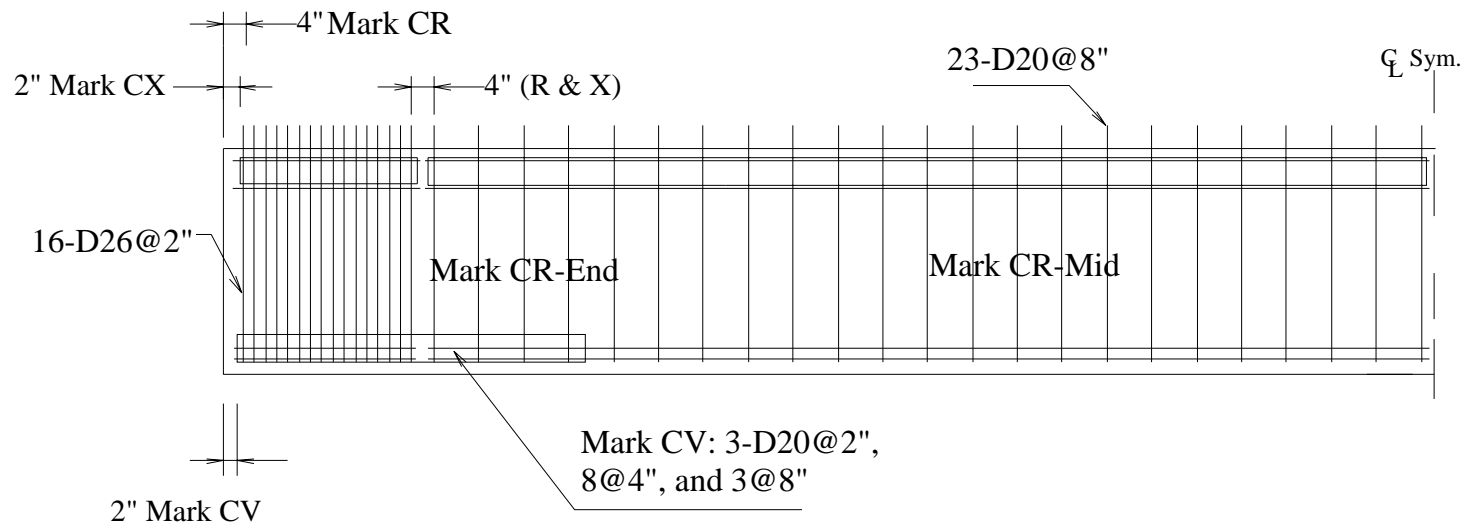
Matching Welded Wire Fabric Substitution Mark CR-End
